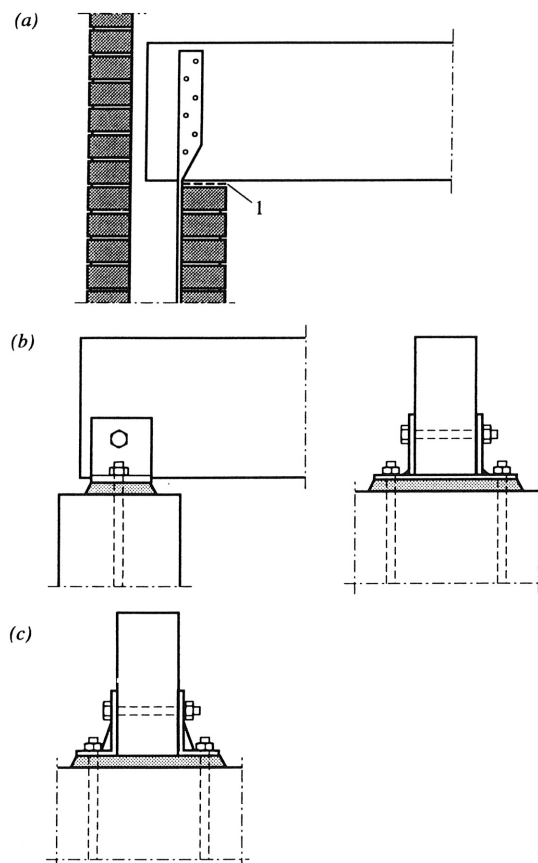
Joint type 1, beam to wall. (a) Steel strap from the foundation nailed to the beam. (b) (c) Anchoring with a steel shoe or two steel angles. In the latter case, the angles as well as the bolts have to be designed for the eccentricity moments. 1 = asphalt felt.
